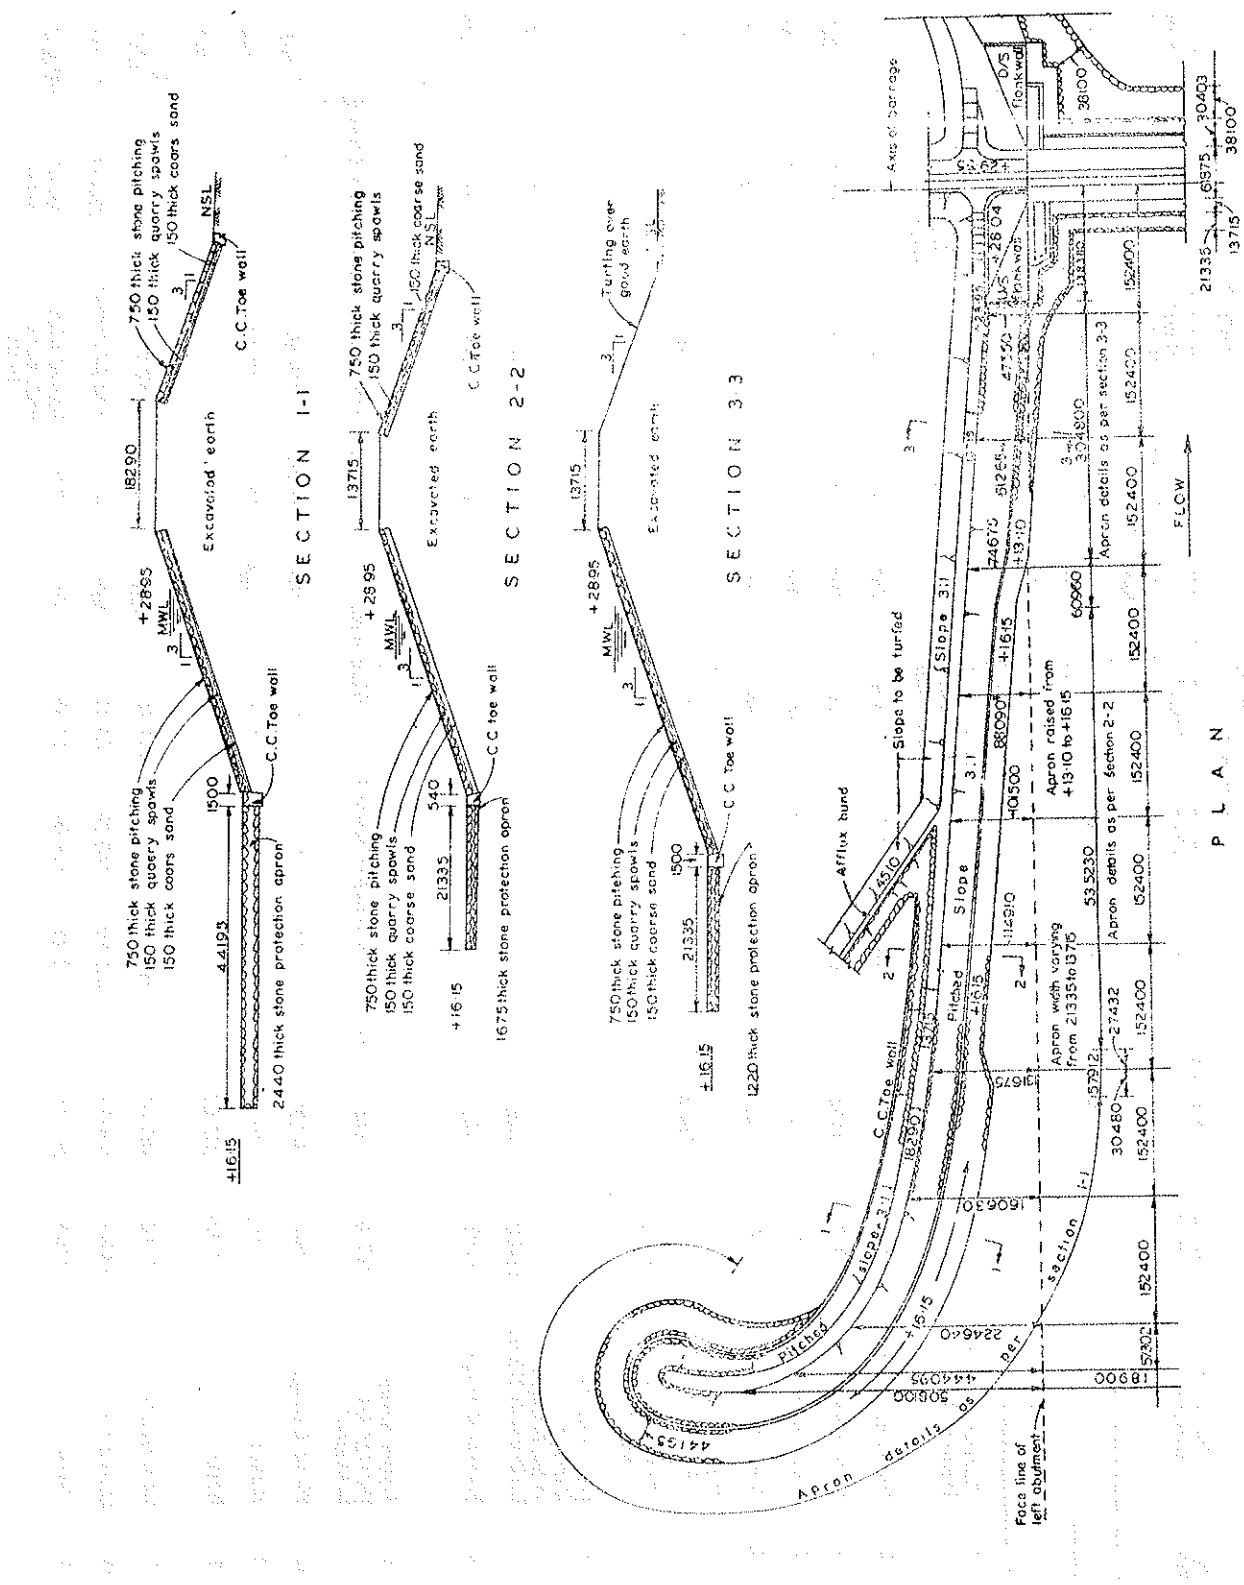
Typical Layout and Sections of Upstream Guide Bund.
